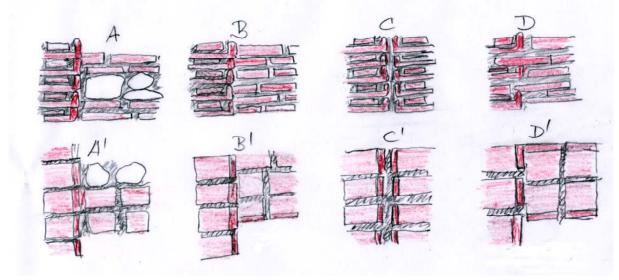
Various types of walls and wall binding in B.CH. A,B,C,D – cross section of contact of walls build of bricks with edge A',B',C'D' – - map of walls binding built of bricks with edge
